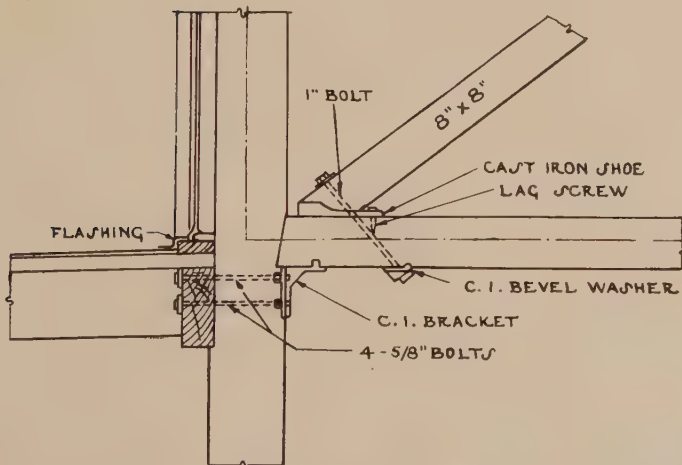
End joint with C. I. shoe, lag screwed instead of lugged into bottom chord.
